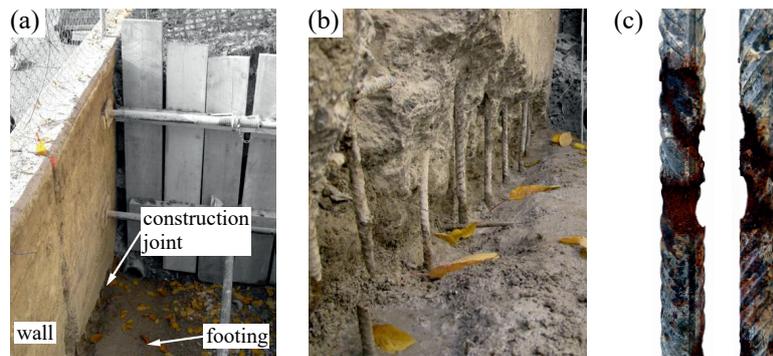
Retaining walls with locally corroded reinforcement: (a) affected wall along motorway (picture from [52]); (b) detail of construction joint with corroded reinforcement (picture from [52]); (c) example of reinforcing bar with local corrosion damage, extracted during the pilot study.
